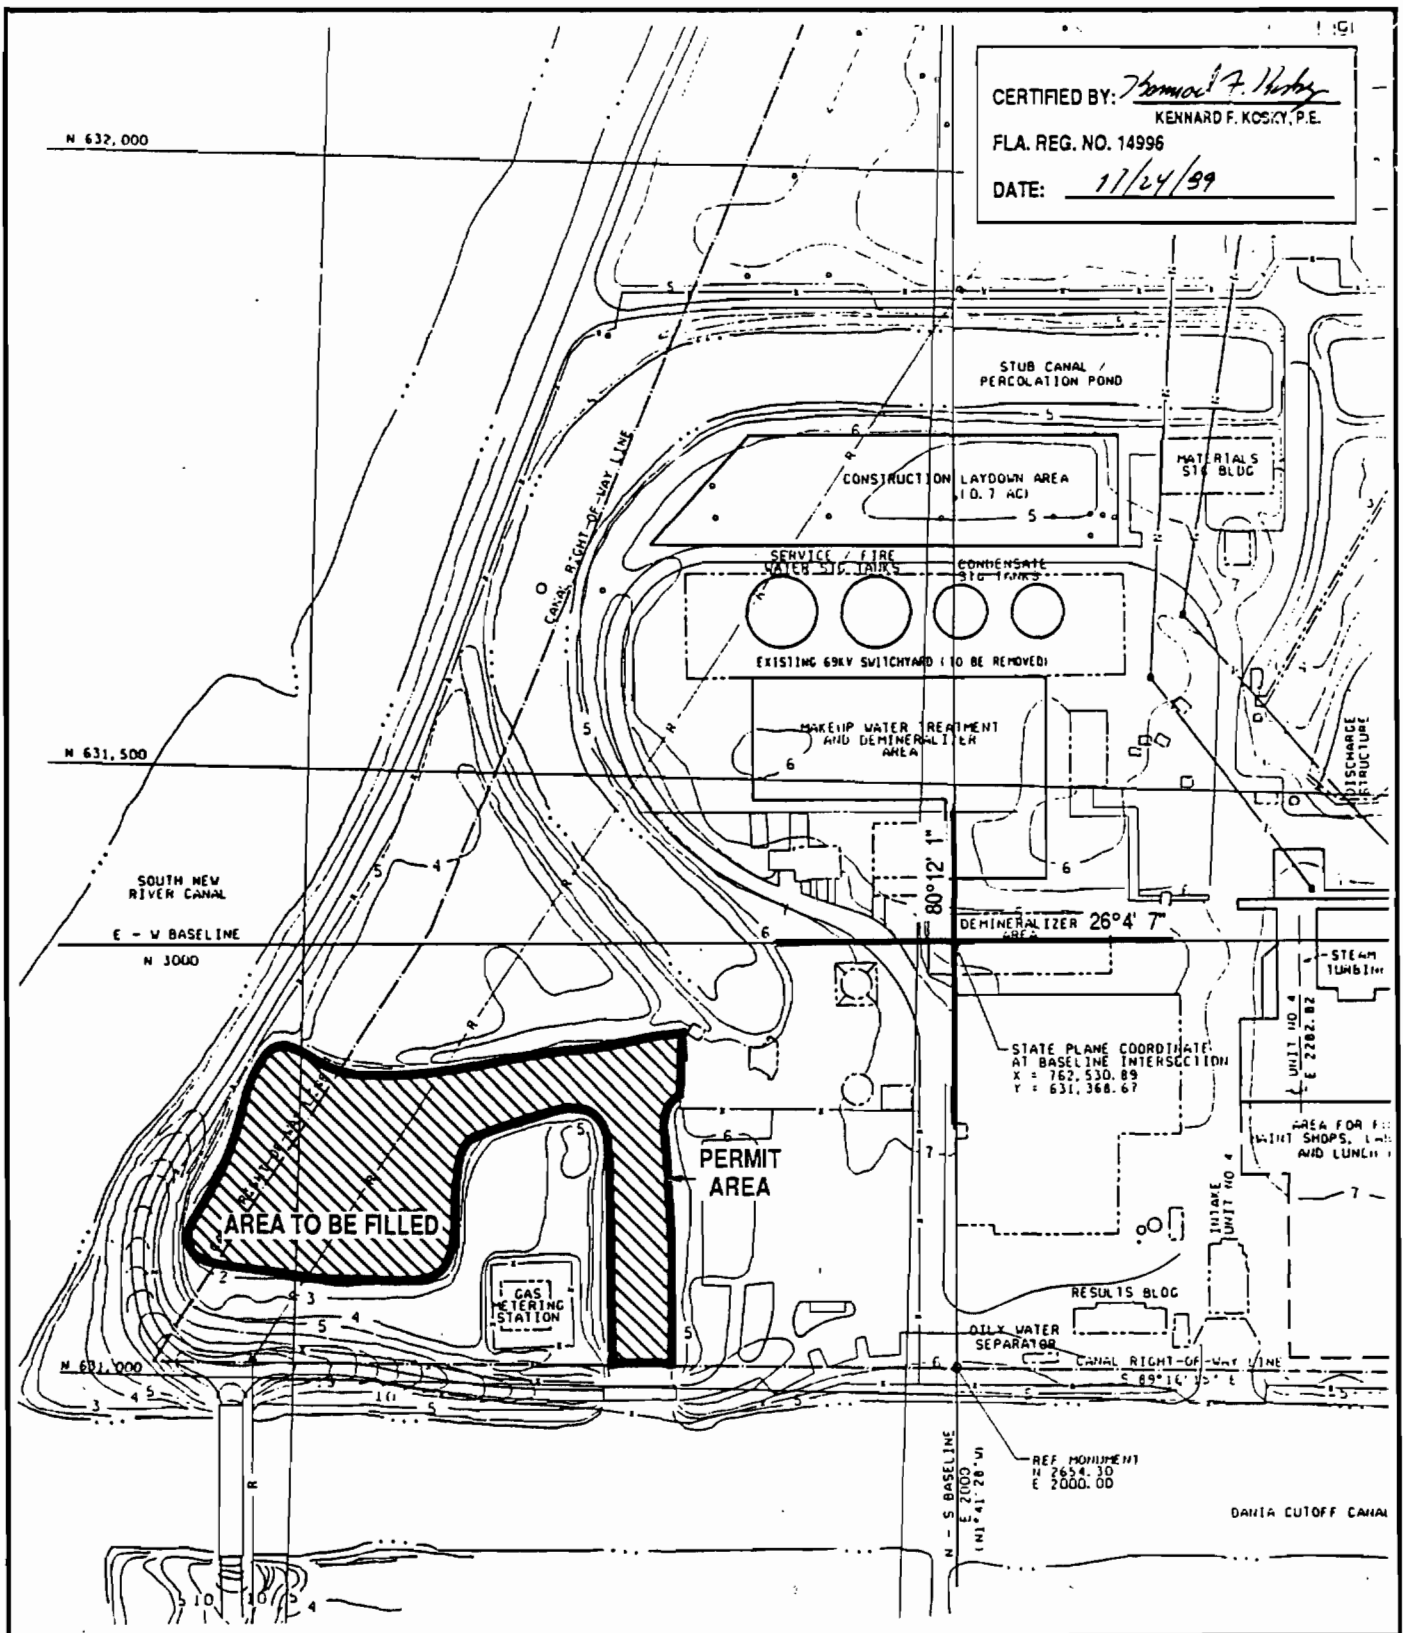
AERIAL OF LAUDERDALE PLANT SITE BOUNDARY
